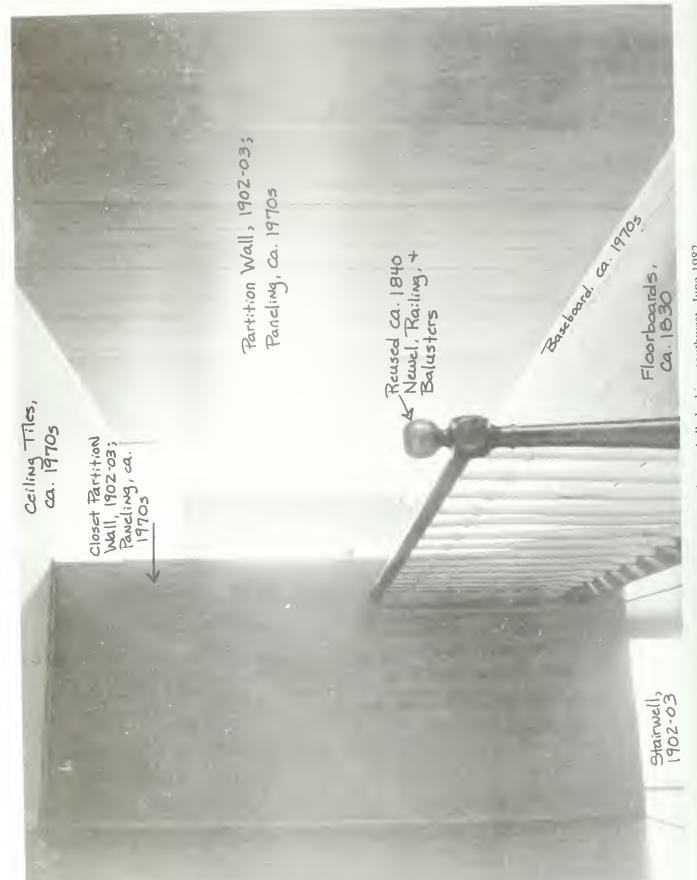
Stanton House: second-story hall, looking southwest, June 1982.
